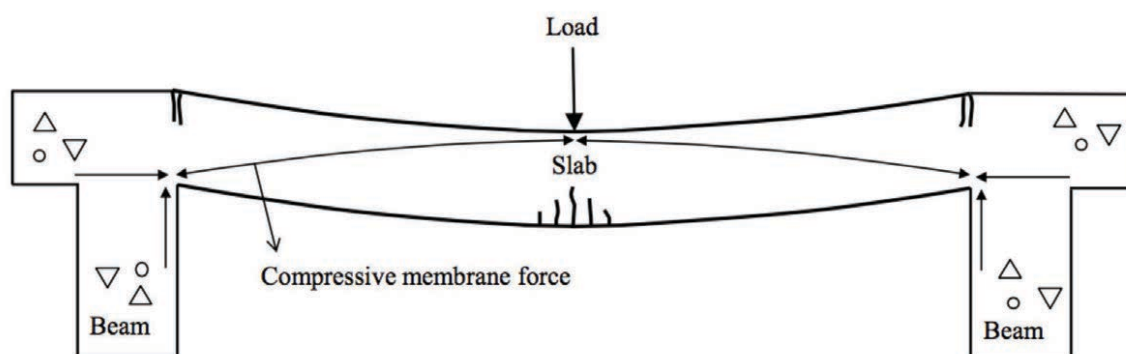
Compressive membrane action in reinforced concrete bridge deck slab
